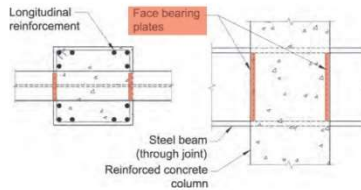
Reinforced concrete column-to-steel beam moment connection.
